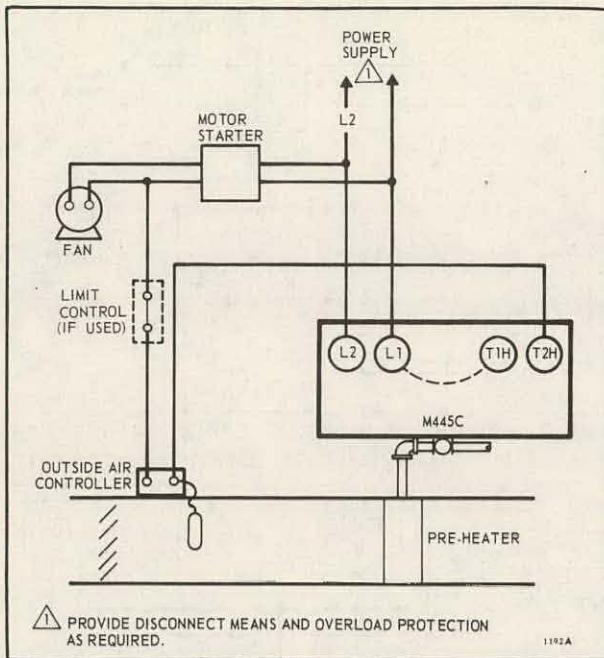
WIRING DIAGRAM FOR AN M445C MODUTROL MOTOR USED TO CONTROL A PRE-HEATER COIL VALVE.
